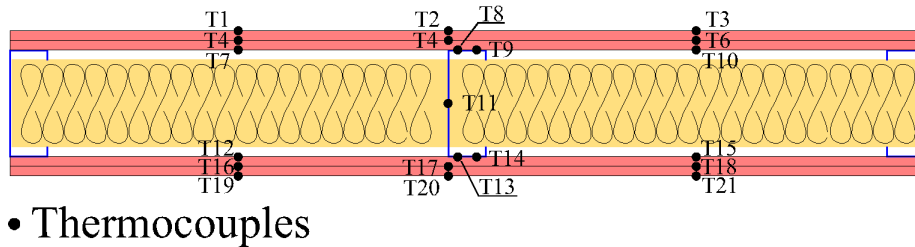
Thermocouples localisation on wall specimens “S1” and “S5”.
